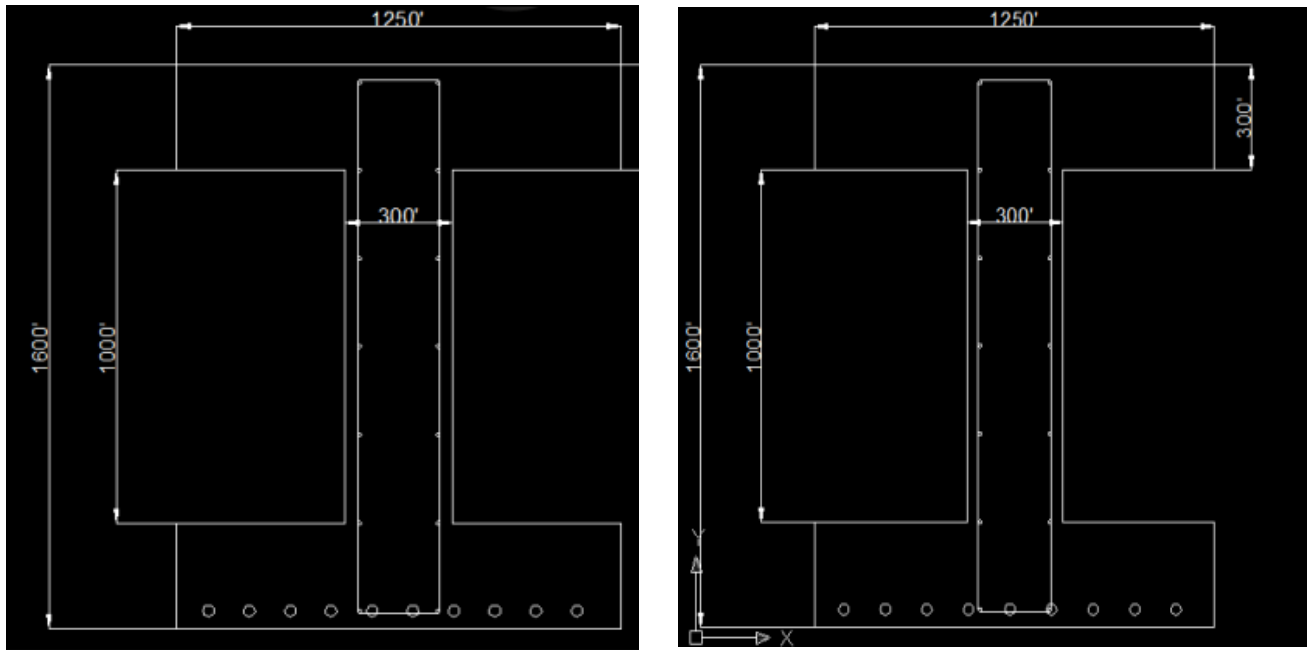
REINFORCEMENT DETAILS FOR RCC I GIRDER
